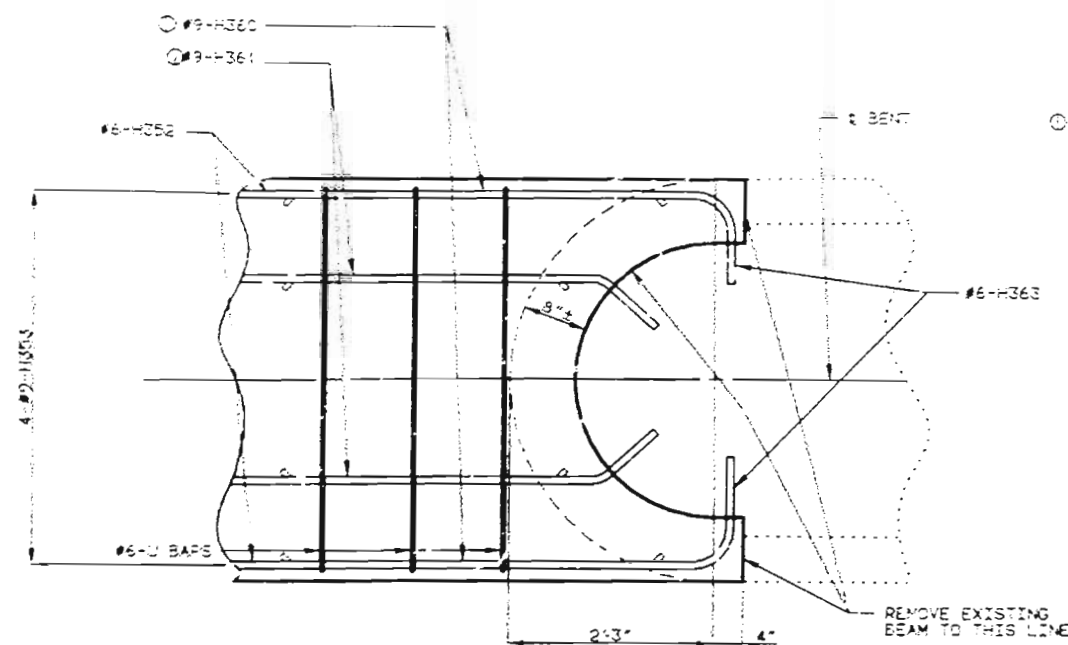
DETAILS OF INT. BENT NO. 13 (SOUTHBOUND LANE)
